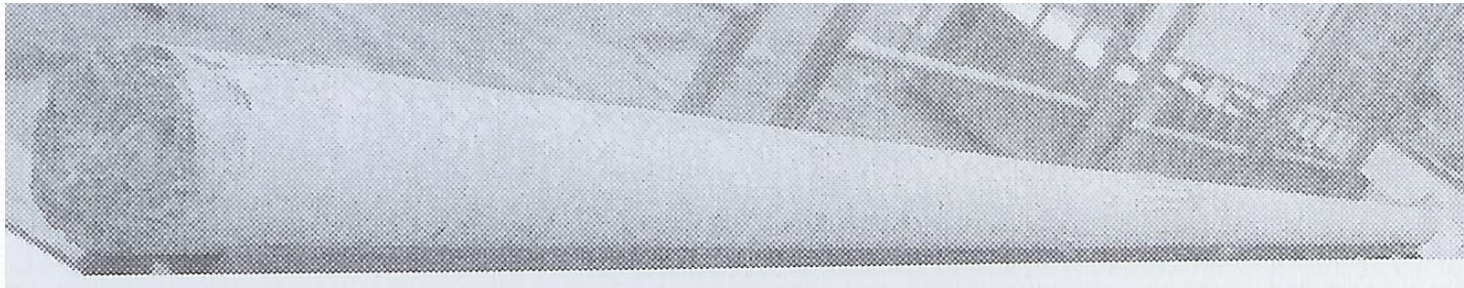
A longest core sample of Longtan RCC dam (15.03 m long)
